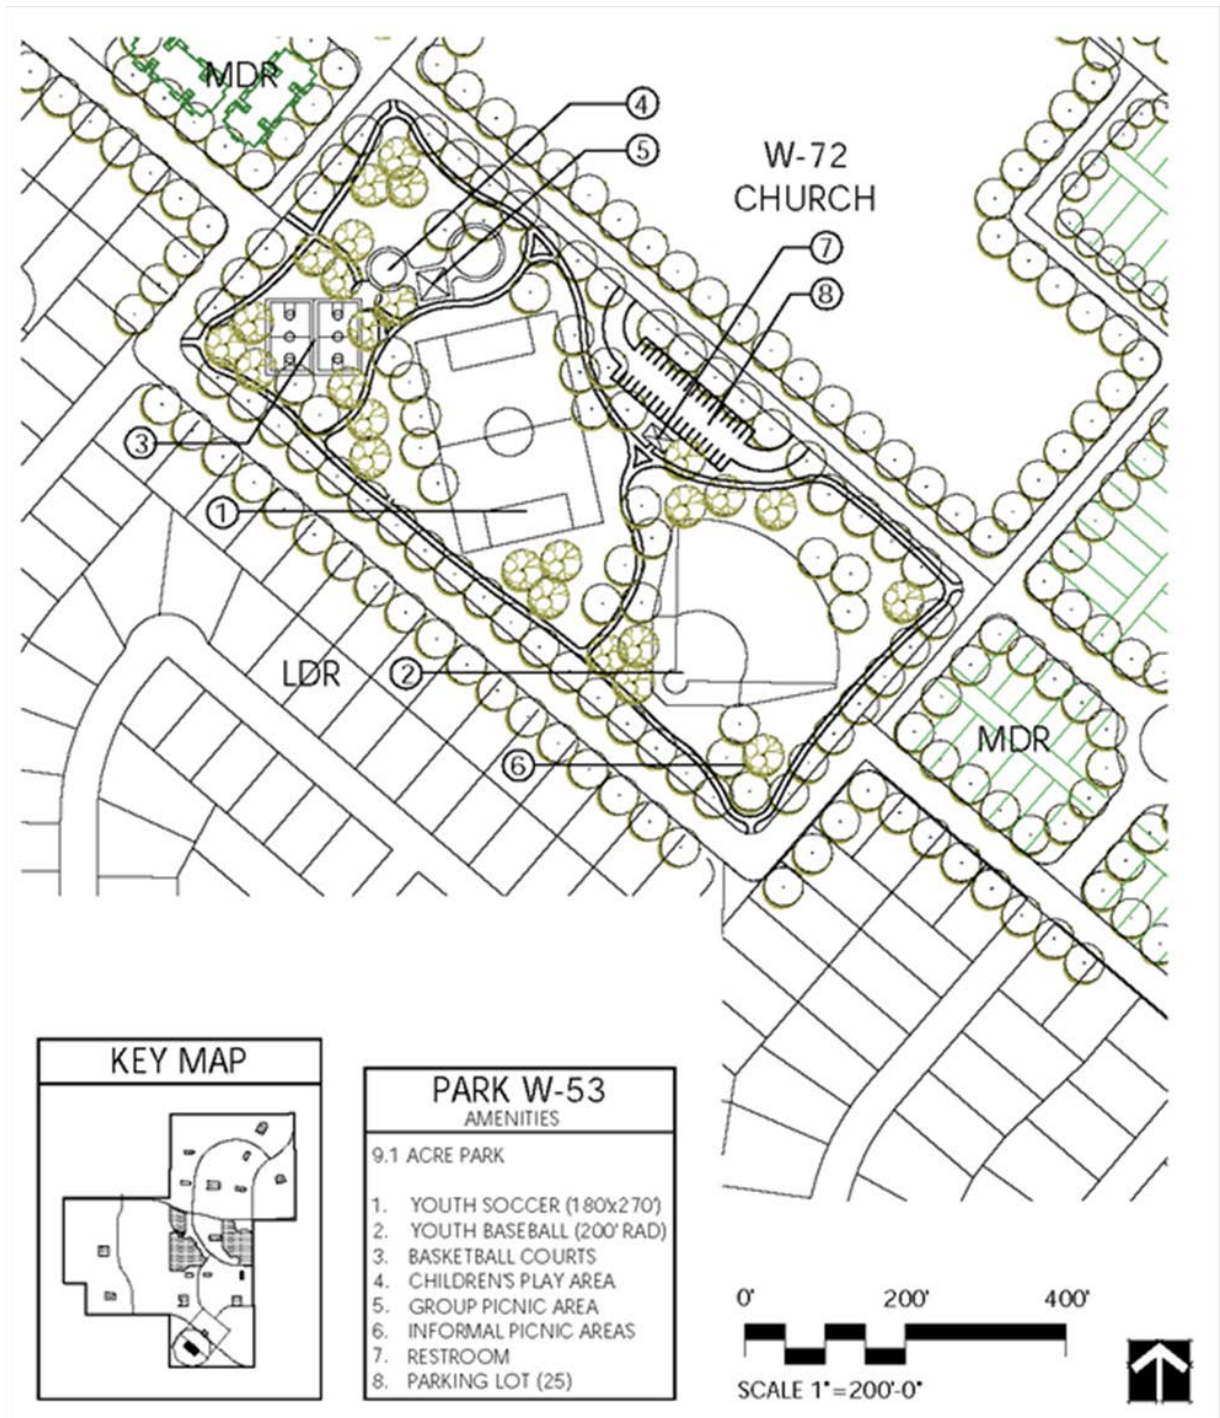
Village Center Neighborhood Park Conceptual Plan
